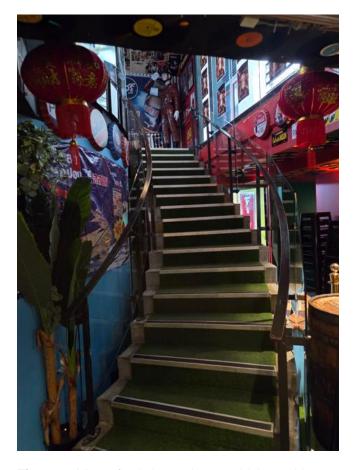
View of existing staircase which provides access from street level to basement tenancy
